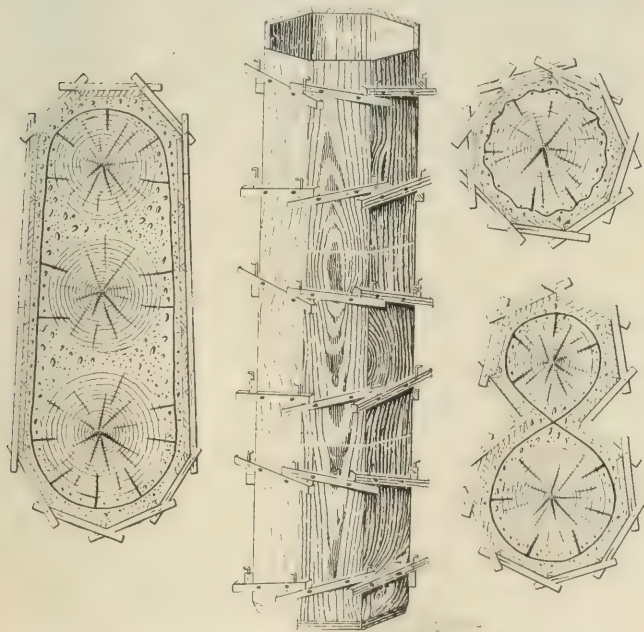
NEUBERT SYSTEM OF ENCASING WOOD PILES IN CONCRETE SHELLS
